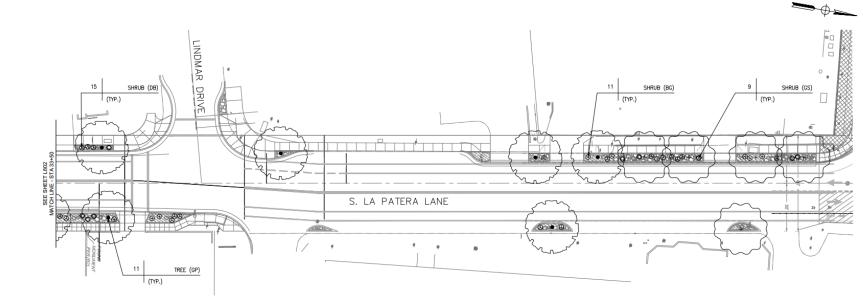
Proposed Site Plan – Southernmost Portion of Project Site
